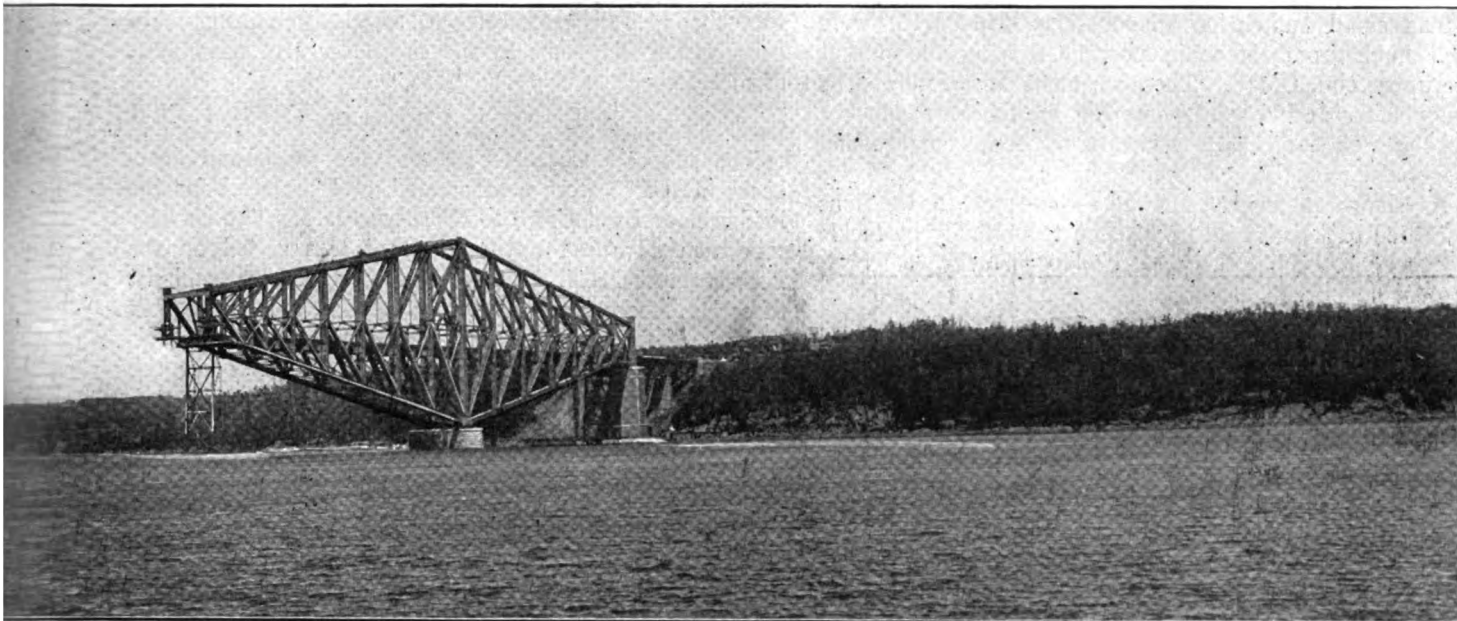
THE QUEBEC BRIDGE ON JULY 31, 1916, WITH BOTH CANTILEVERS COMPLETED. ON THE SOUTH ARM, TO THE LEFT, THE ERECTION TRAVELER IS IN ITS LAST POSITION. THE NORTH ARM, TO RIGHT, ALREADY HAS IN PLACE HANGING TRUSS, FOR GUIDING THE SUSPENDED SPAN DURING ITS MOORING
